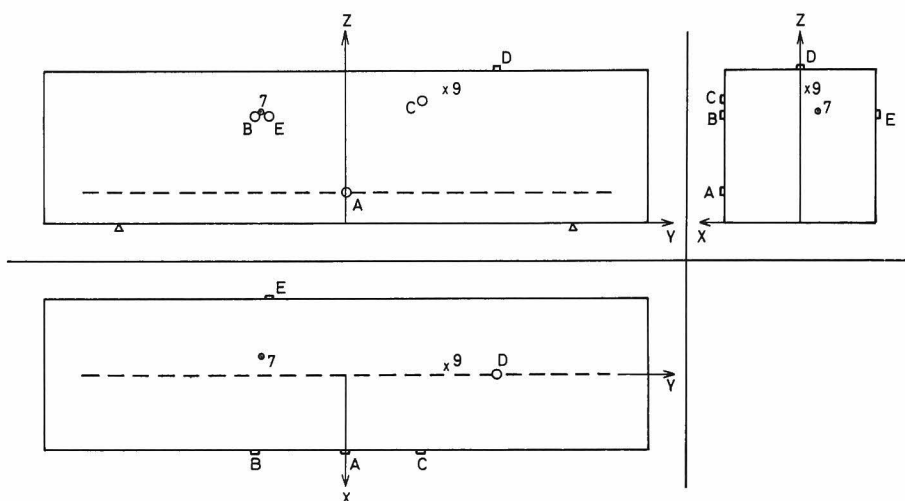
Location of transducers A, B, C, D, E and sources 7, 9 in a bending test of a reinforced concrete beam.
